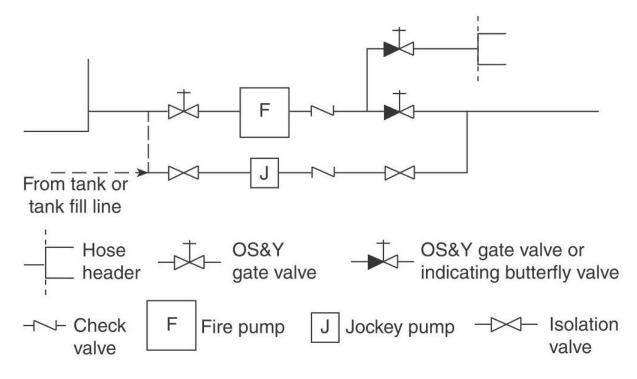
Jockey Pump Installation with Fire Pump.
